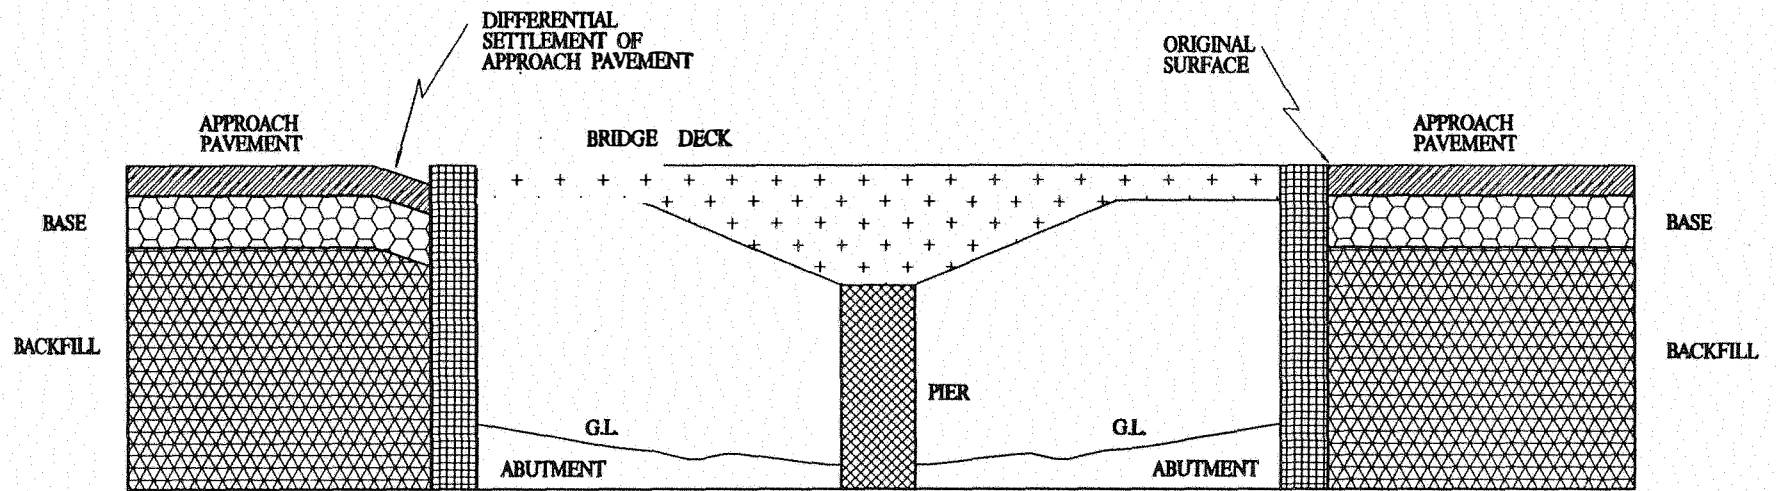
Schematic of excessive differential settlement of approach pavement
